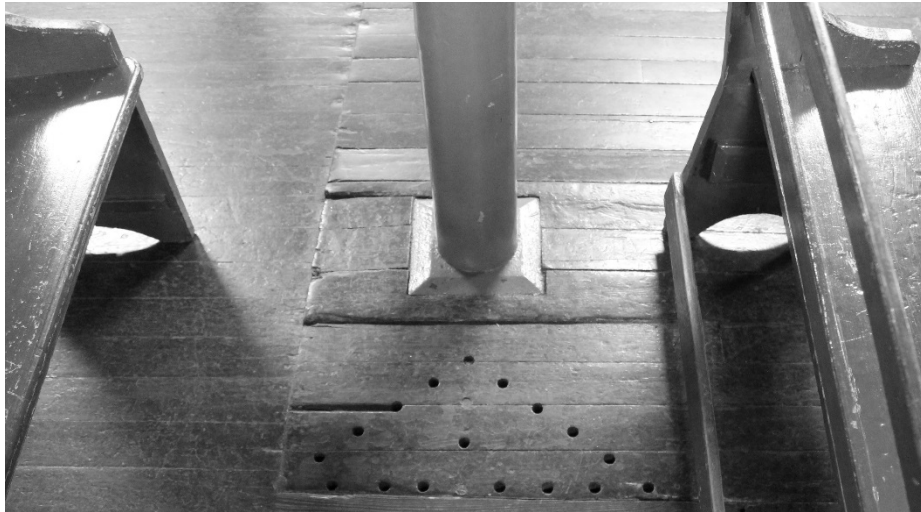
Image of the pipe column at wood flooring in the Fellowship Hall of the First African Baptist Church. (Photograph by the author)
